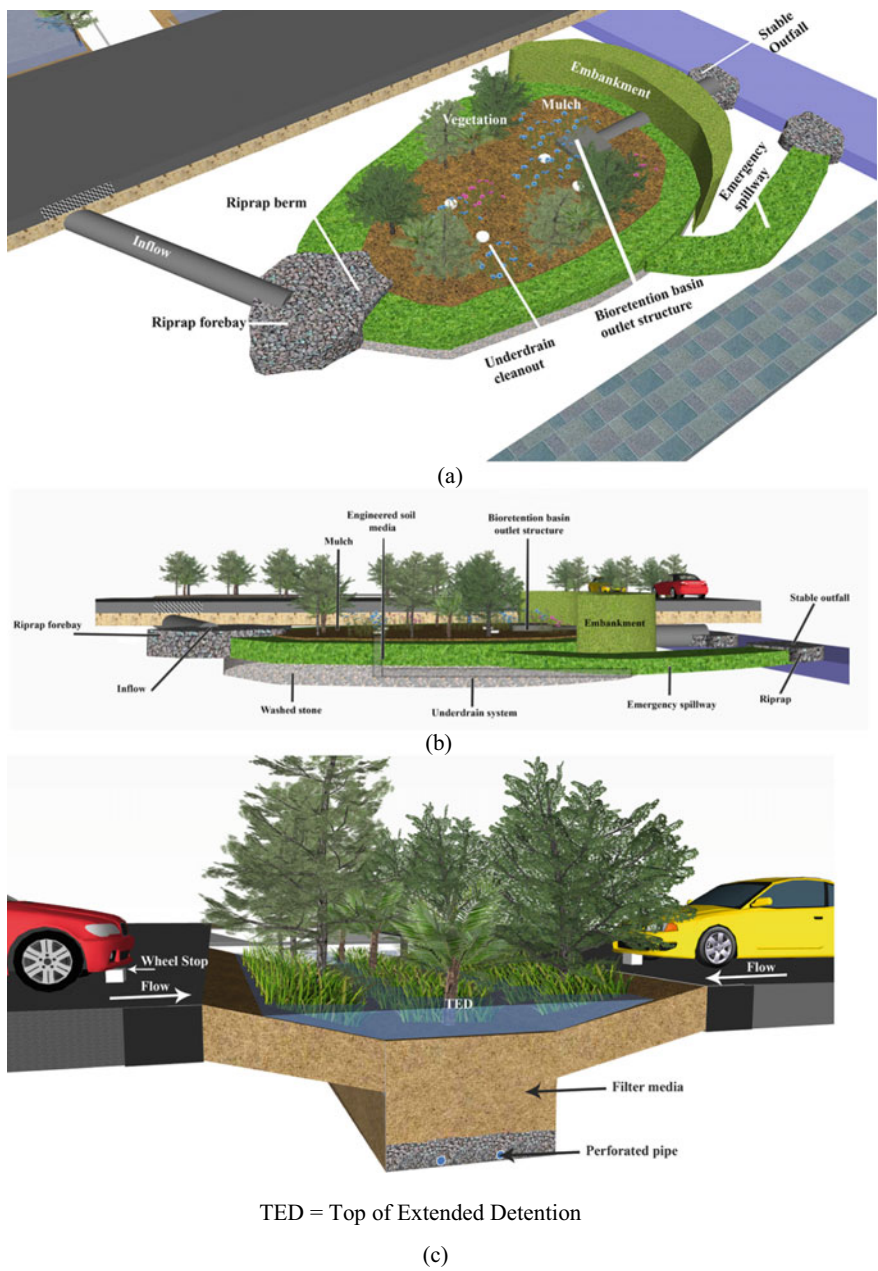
a Bio retention basin plan, bio retention basin integrated into b car park and c local streetscape
